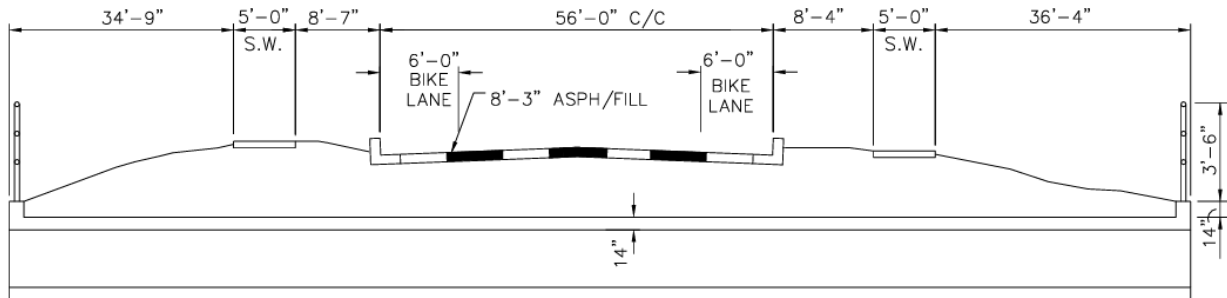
Cross-section view of culvert with sidewalks on both sides (Example 1)
